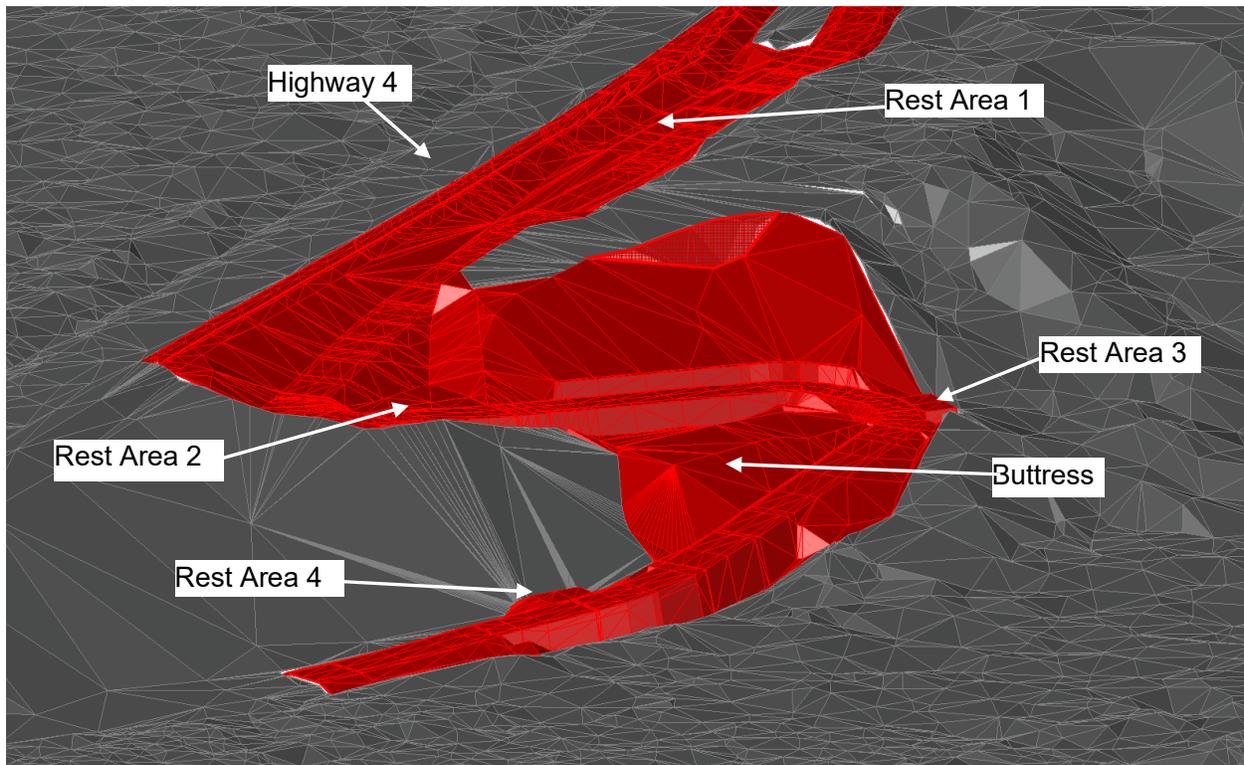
A 3D Rendering of proposed trail looking northeast (from low to high)
